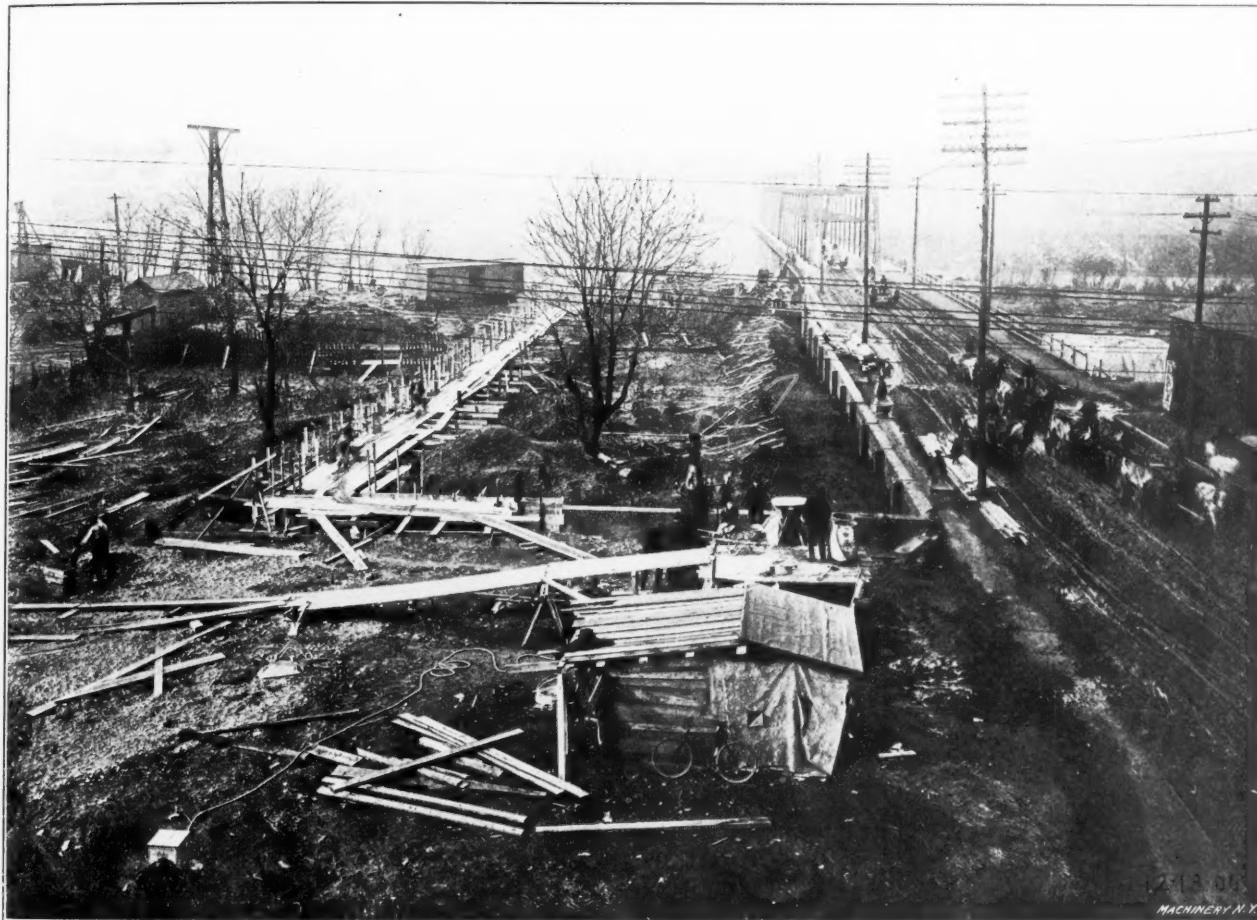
A Job on which the Contractor put in a Bill for 1,000 Extra Cubic Yards of Excavation. The Photograph Helped to settle the Bill for Something like 100 Yards.
